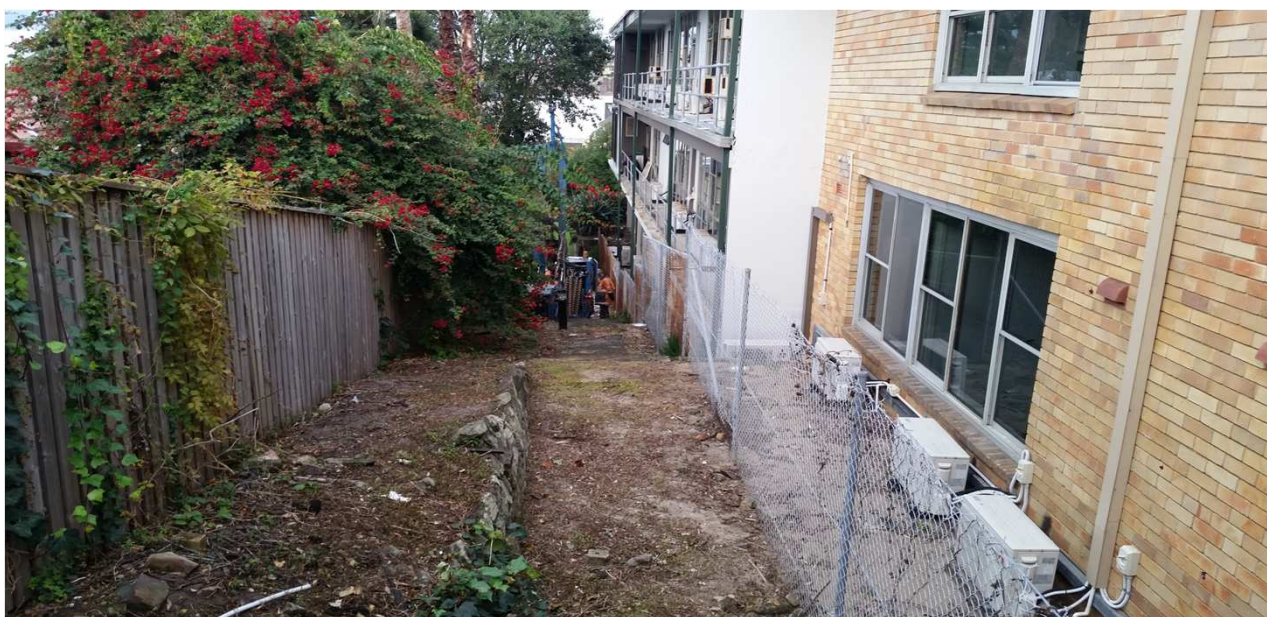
Looking south towards BH02 with drill rig set up over hole
